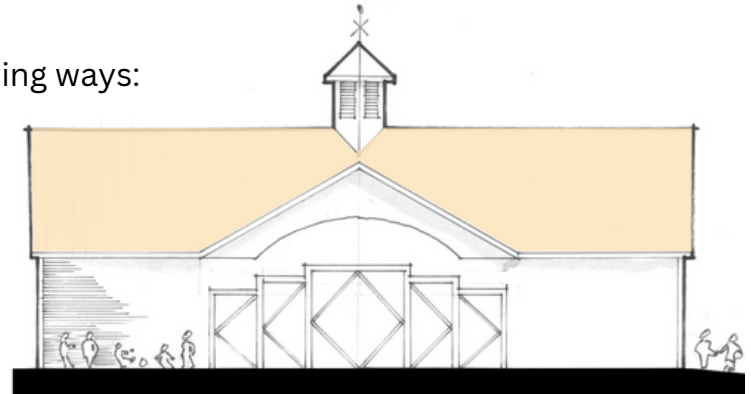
Example of exterior view (west elevation) highlighting elements of rural character through the architecture.
